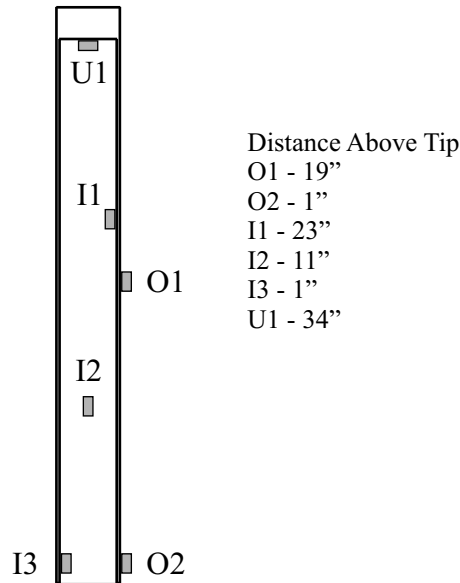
Layout of pore-pressure transducers mounted on the model caisson.
